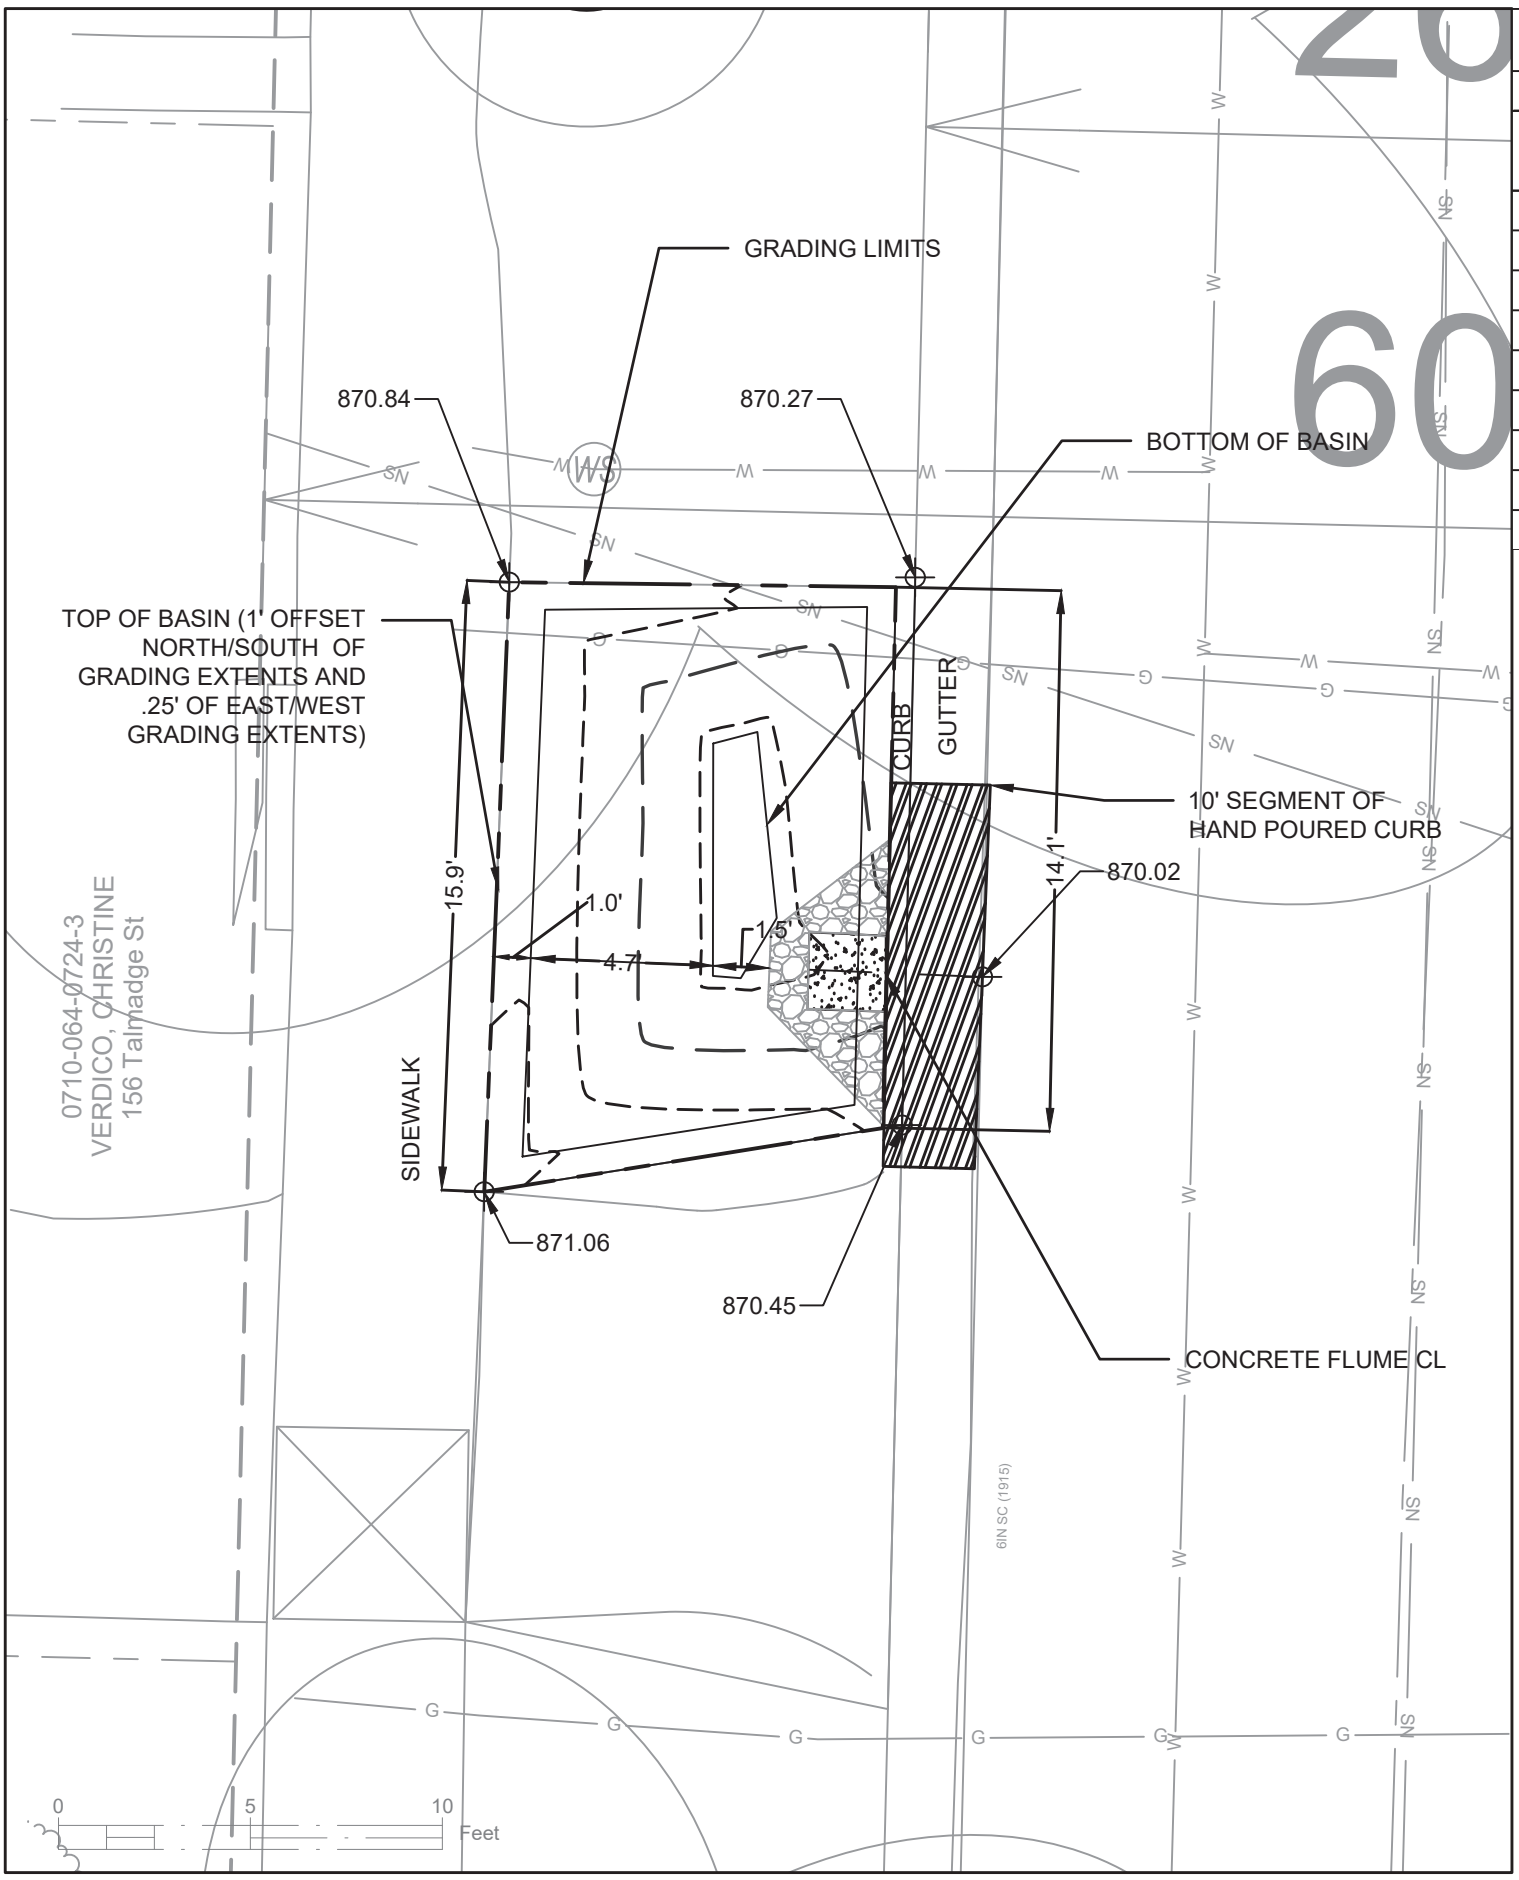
### DETAIL POINT ELEVATIONS/DESCRIPTIONS
